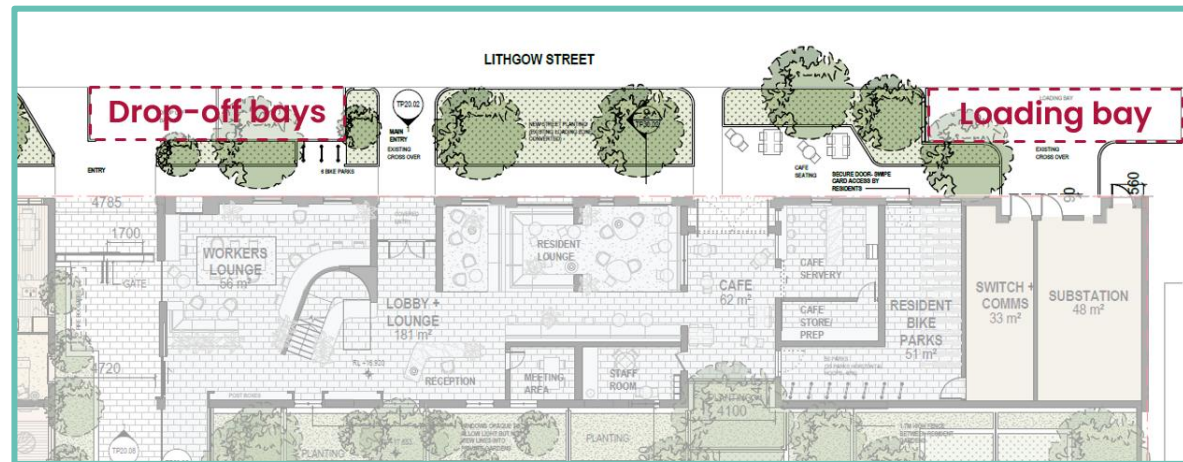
The proposed access arrangement at the ground floor frontage to Lithgow Street. Source: Warren and Mahoney.
